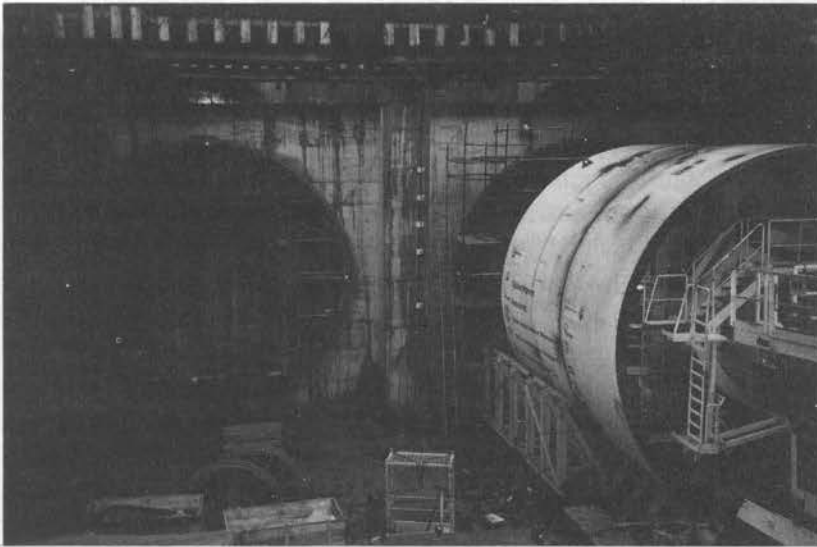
Tunnel boring machine installed for the start of the second Heinenoord tunnel
